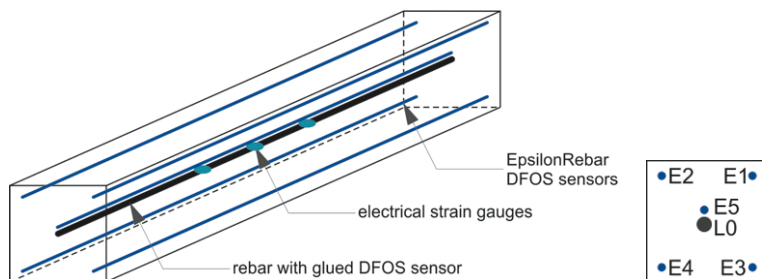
DFOS sensors in concrete beams and their nomenclature
